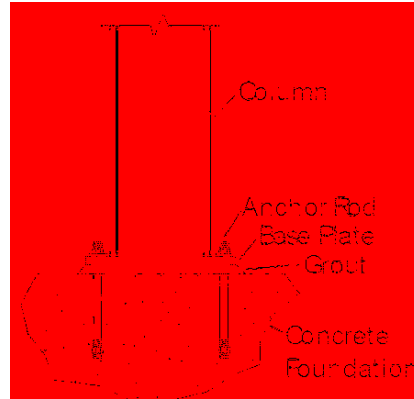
Exposed base plate connection commonly used at the base of steel buildings.
